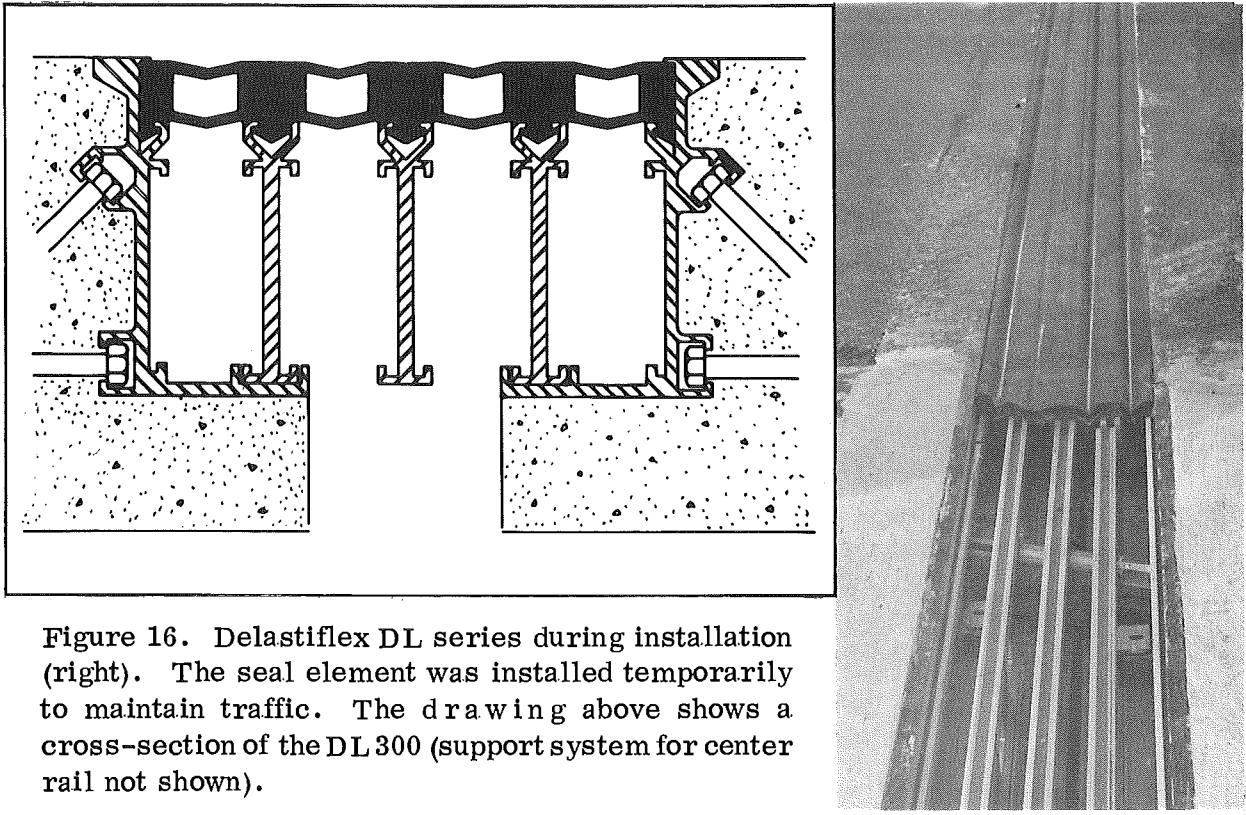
Delastiflex DL series during installation (right). The seal element was installed temporarily to maintain traffic. The drawing above shows a cross-section of the DL 300 (support system for center rail not shown).
